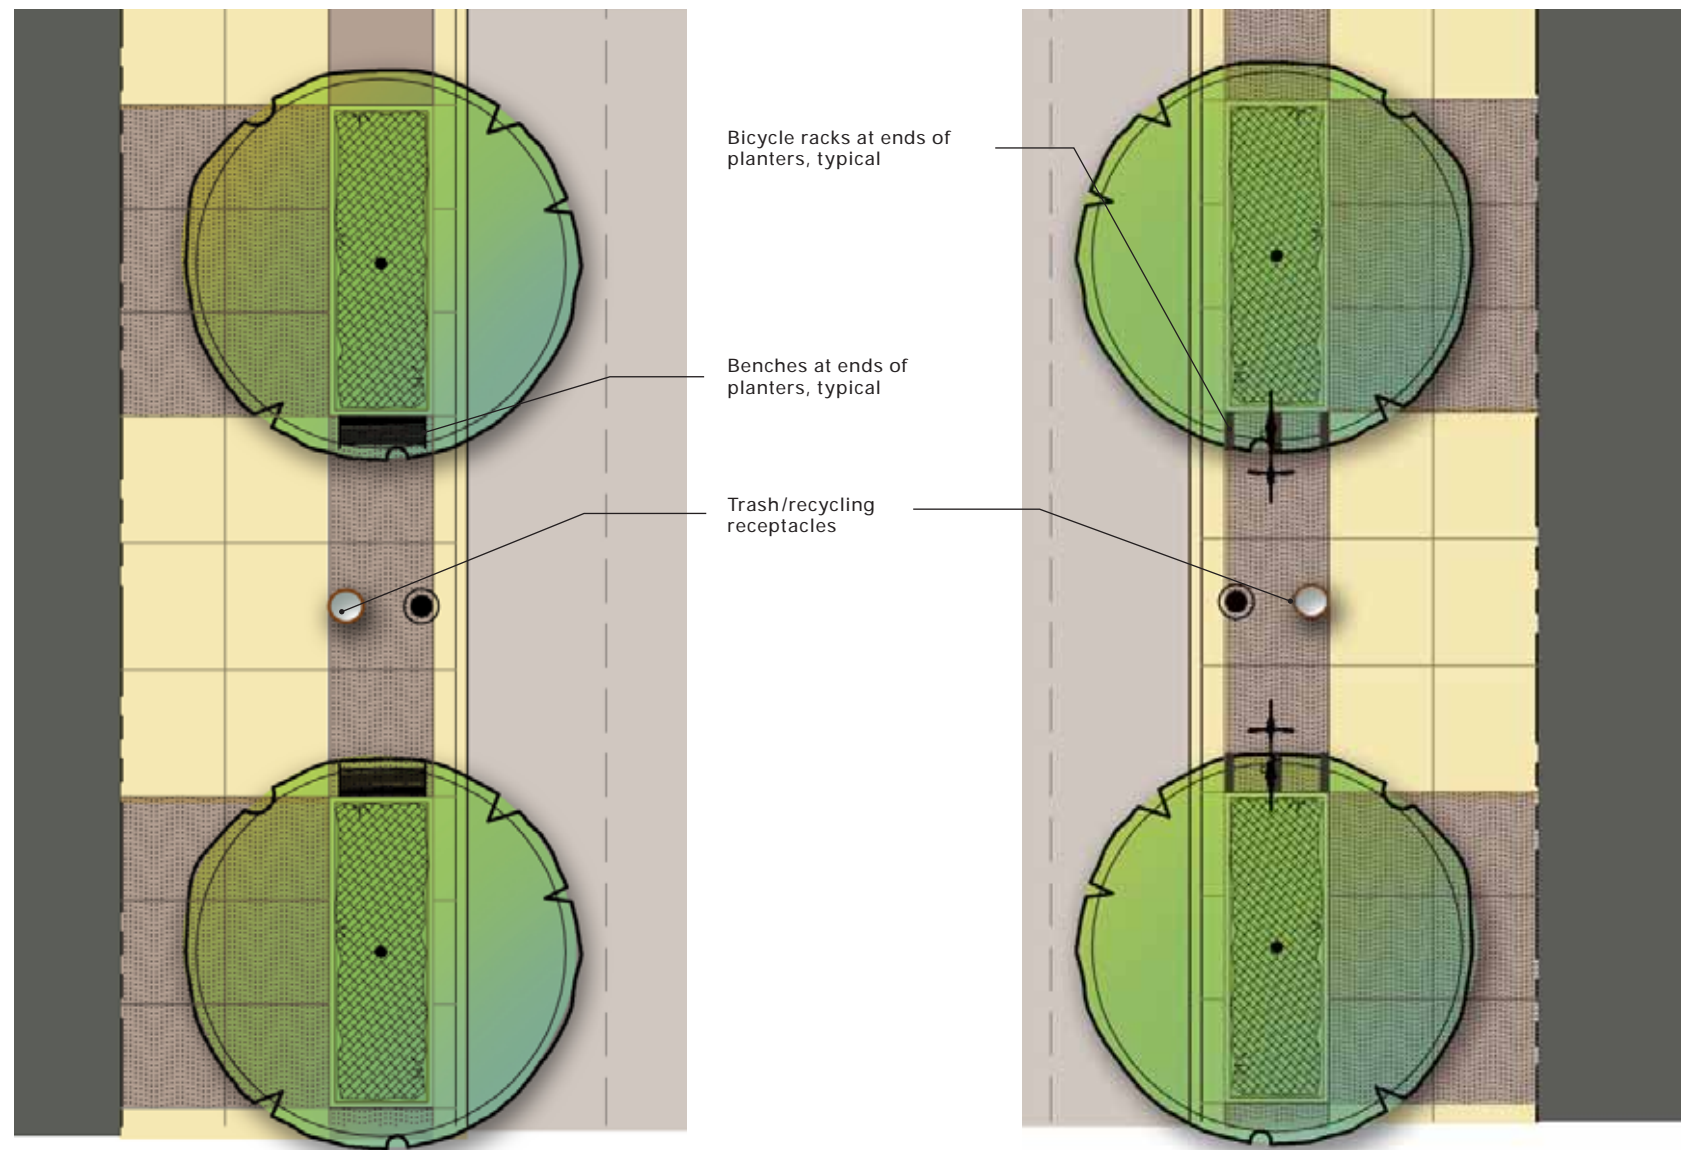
Example of street furniture configuration showing benches at the ends of planters with a trash/recycling receptacle and light post centered in between.
